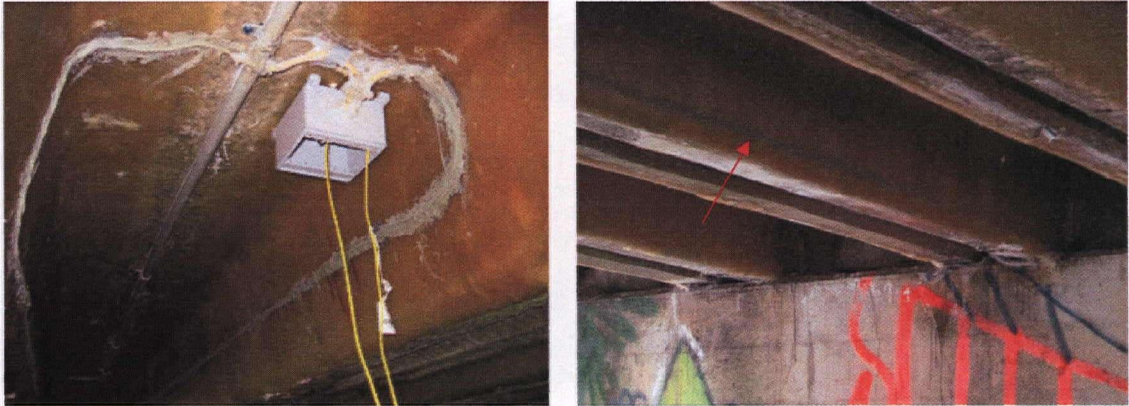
Field Test 2005 Site Photos: [a] FT-Sensor on Girder 6 with Storage Box Open; [b] FT-Sensor Covered with Protection Epoxy
